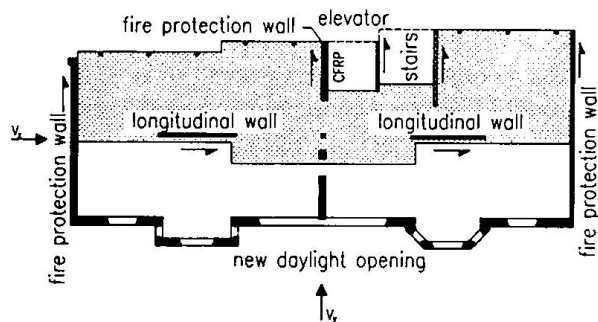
Bearing structure 1st to 4th floors, after remodeling
